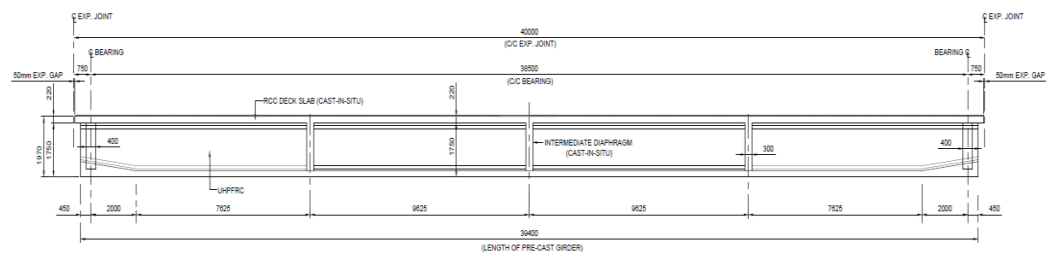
33 Elevation of 40m span UHPFRC post tensioned I girder
